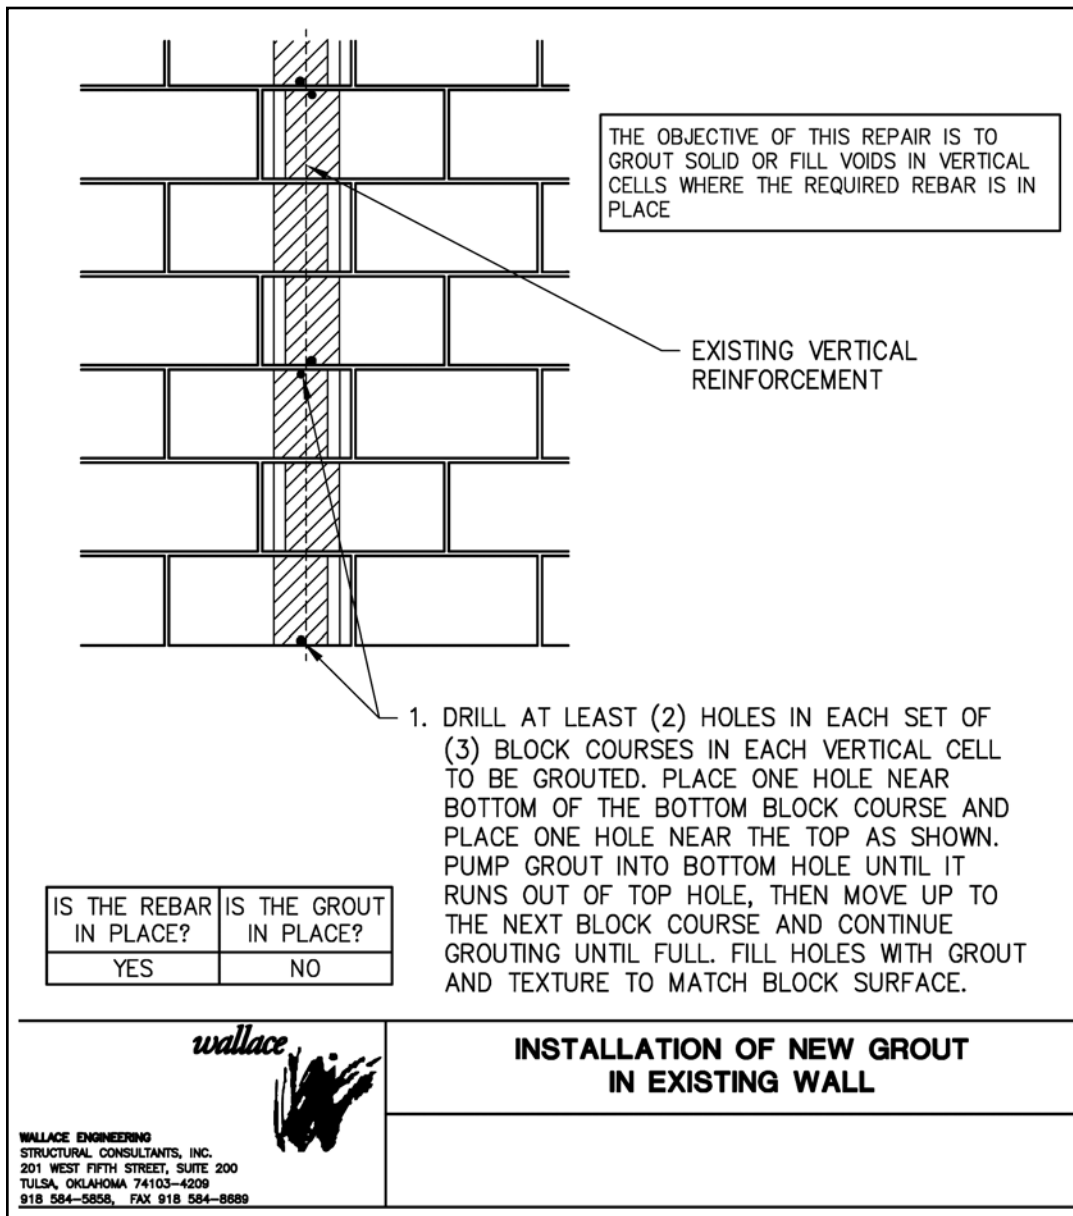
Sample Repair Detail for a CMU Wall with Vertical Discontinuities
